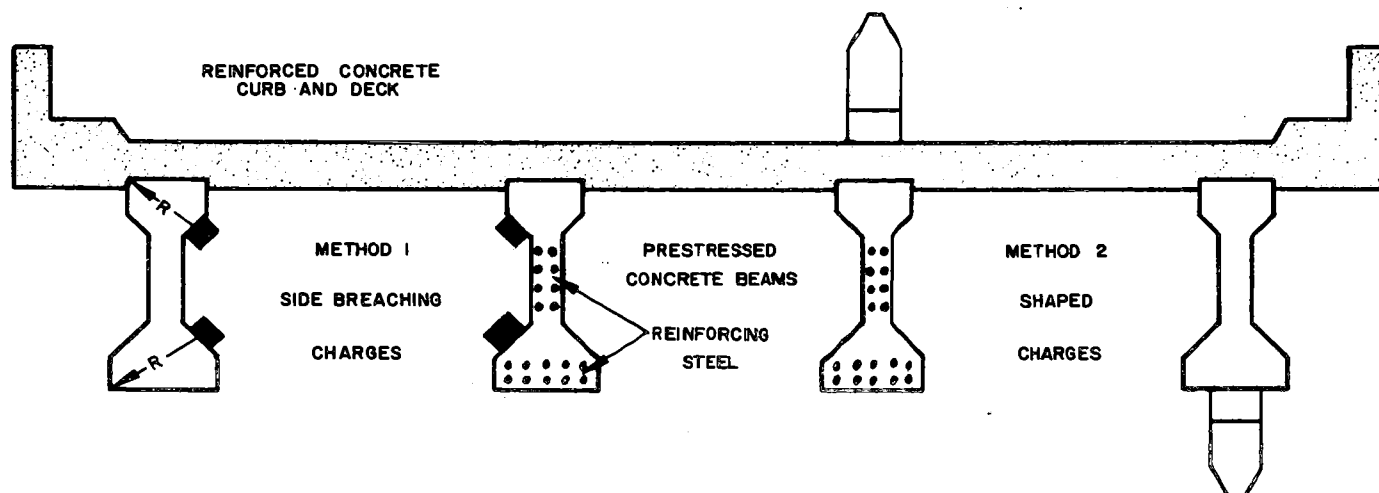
Demolition of prestressed concrete beam superstructures.
